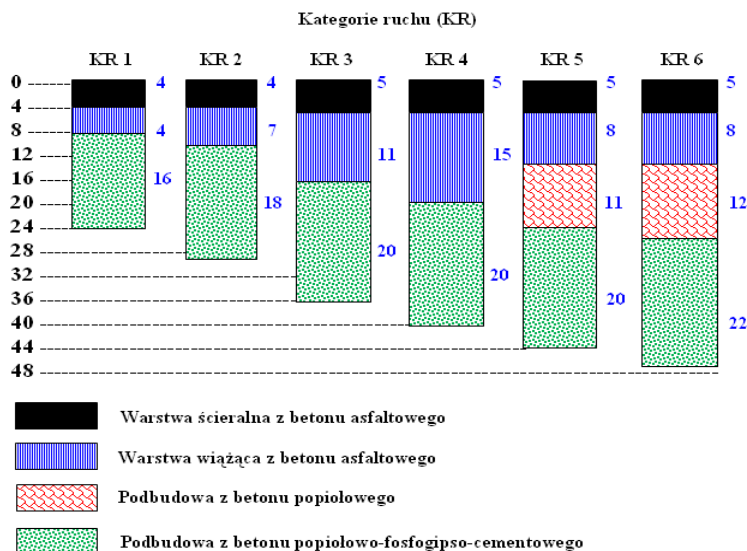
Cross-section of a road surface obtained using asphalt concrete and subsoil of ash-phosphogypsum-cement concrete, constituting the load-bearing part of the road surface (compressive strength 5.0-8.0 MPa according to the PN-S-06103 standard) [H 7].
